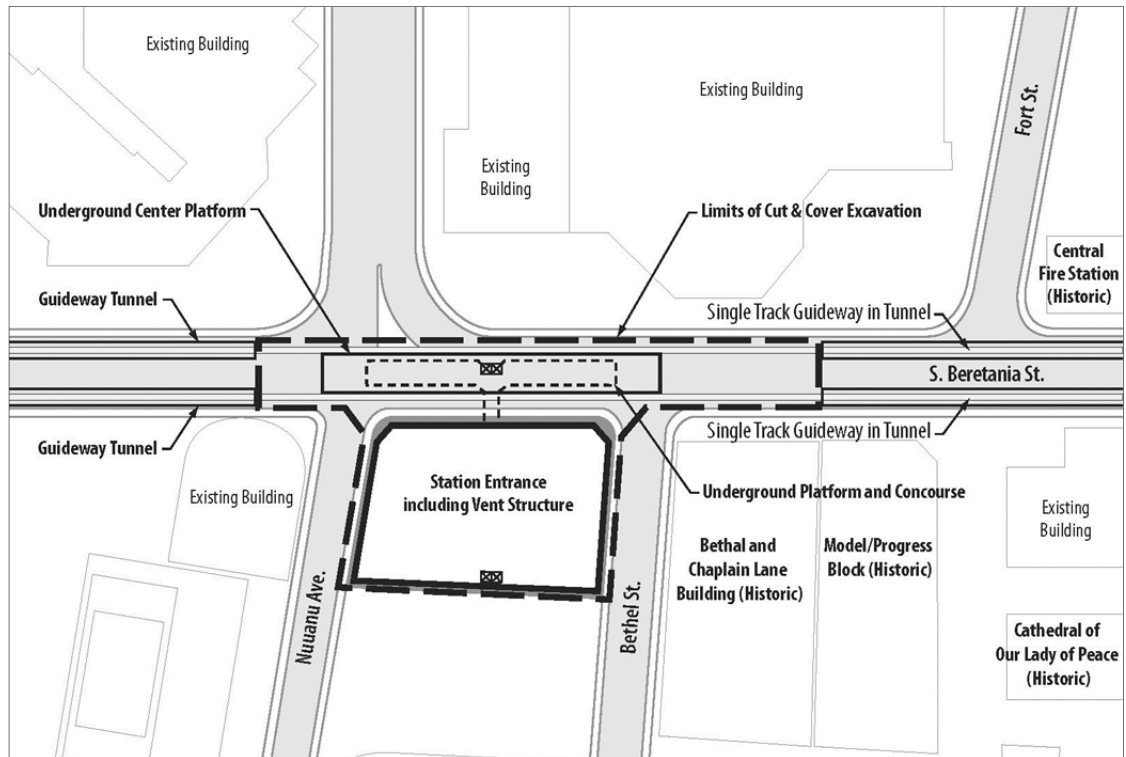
Beretania Street Tunnel Alternative Fort Street Station
